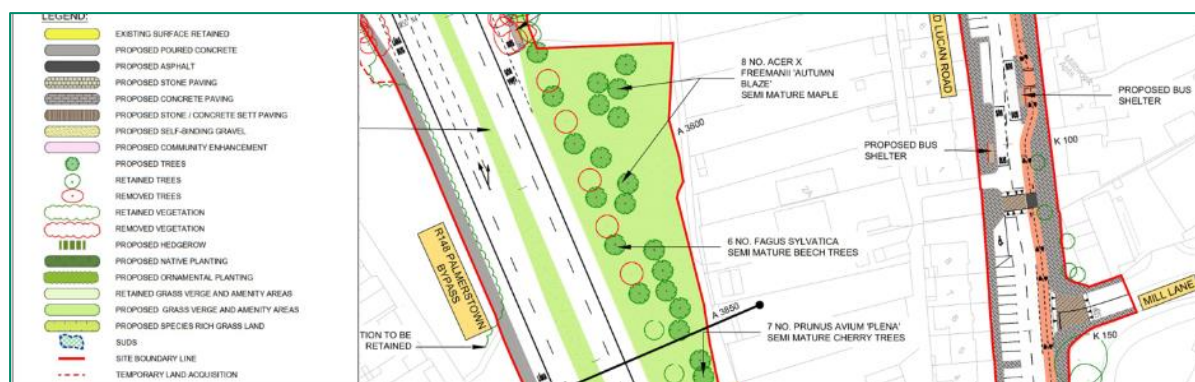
Extract from Landscape General Arrangement Drawings (Sheet 14)
